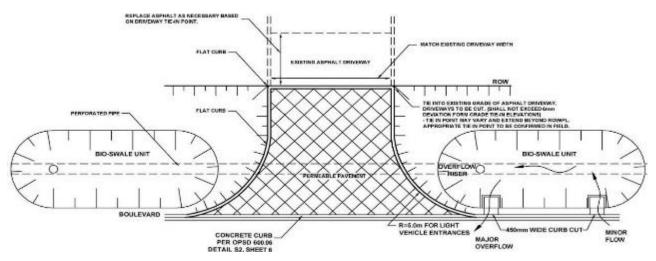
Typical configuration and layout of LID practices implemented within the residential right of ways.
